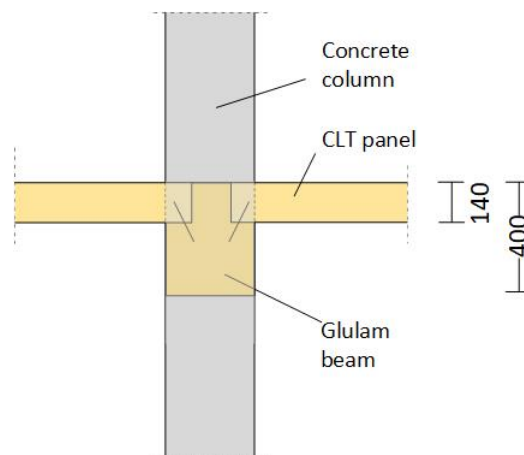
Connection CLT panel floor and glulam beam on bearing block
